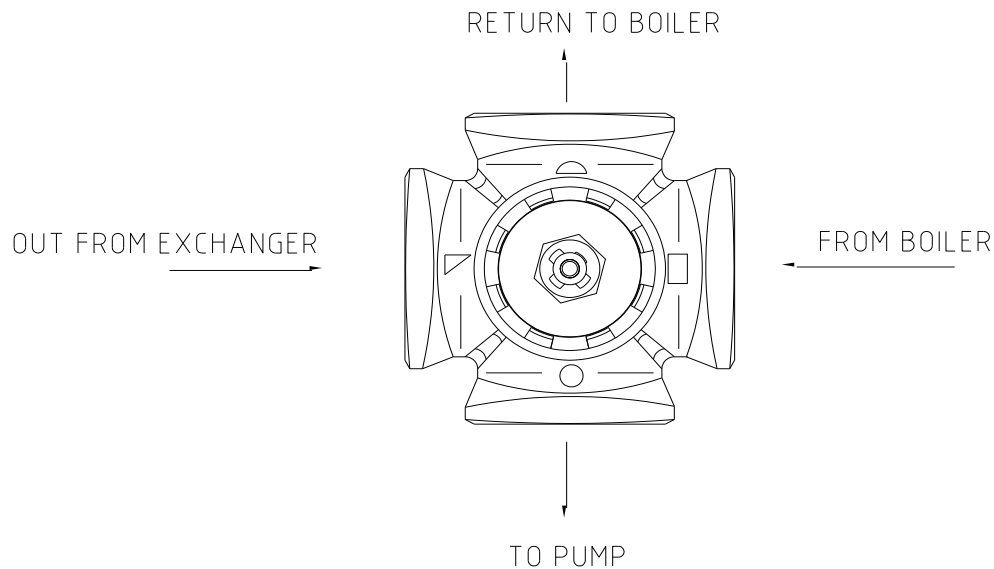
PLATE HEAT EXCHANGER INSTANTANEOUS WATER HEATING
